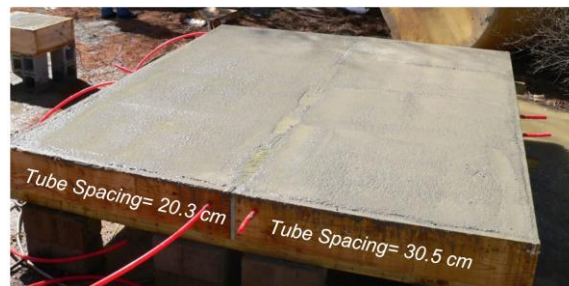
Photograph showing the poured concrete into the deck frame works (Bowers, 2016)
